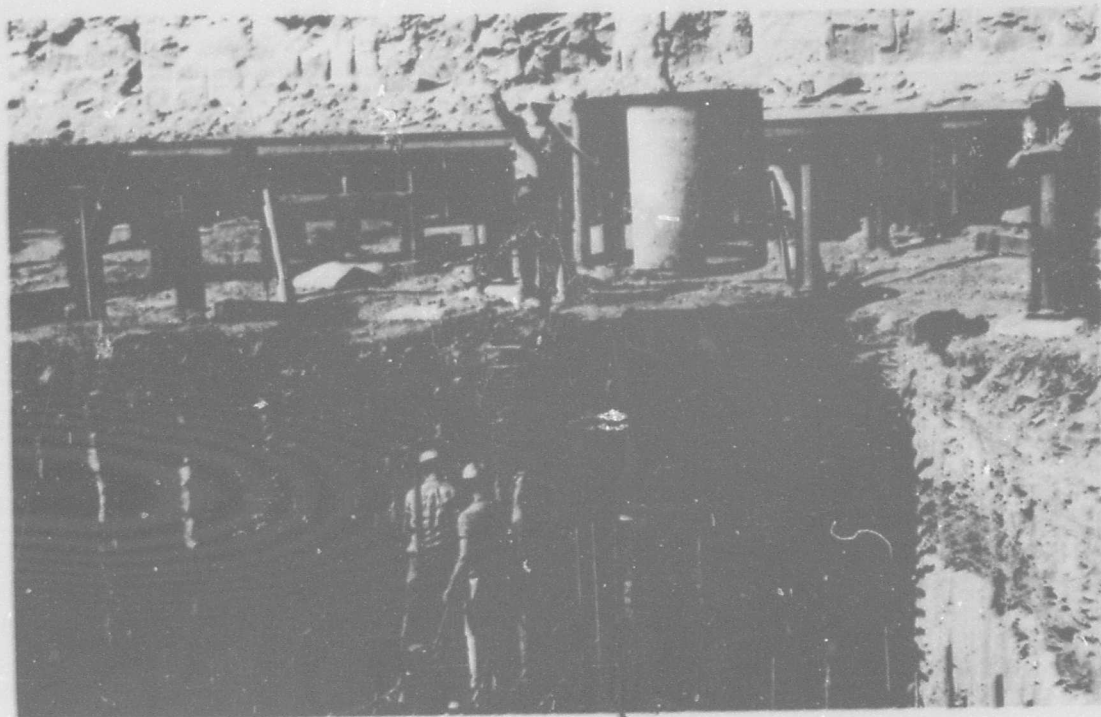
Concrete Pour on Full Scale Closure and Access Shaft.
